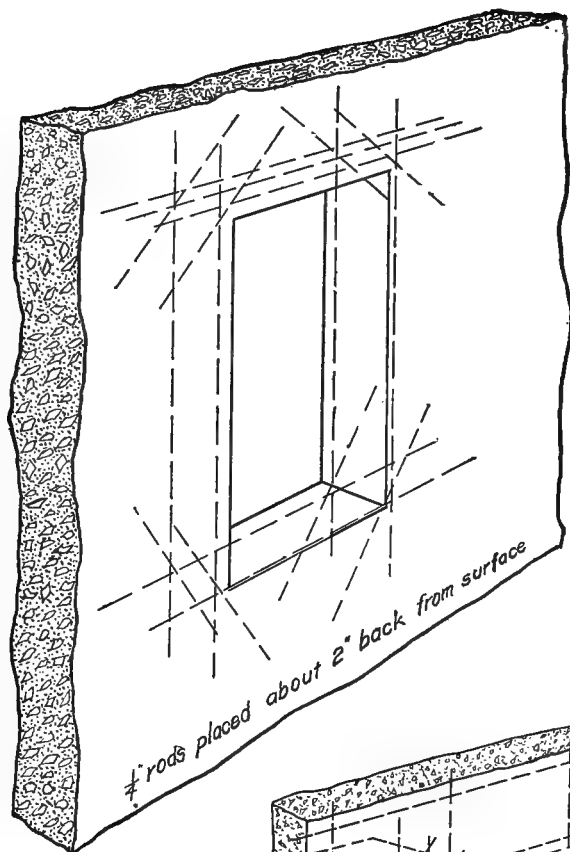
Method of placing reinforcing rods around wall openings less than 4 feet in width.
